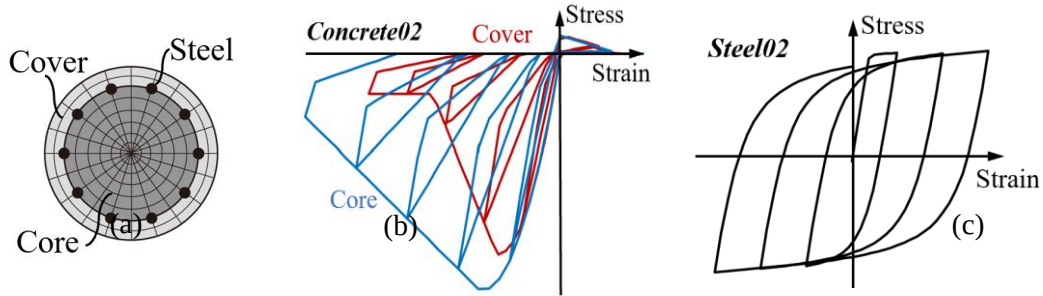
Numerical modelling of structural member: (a) fibre section discretisation of pier and piles; (b) concrete model; (c) steel model.
